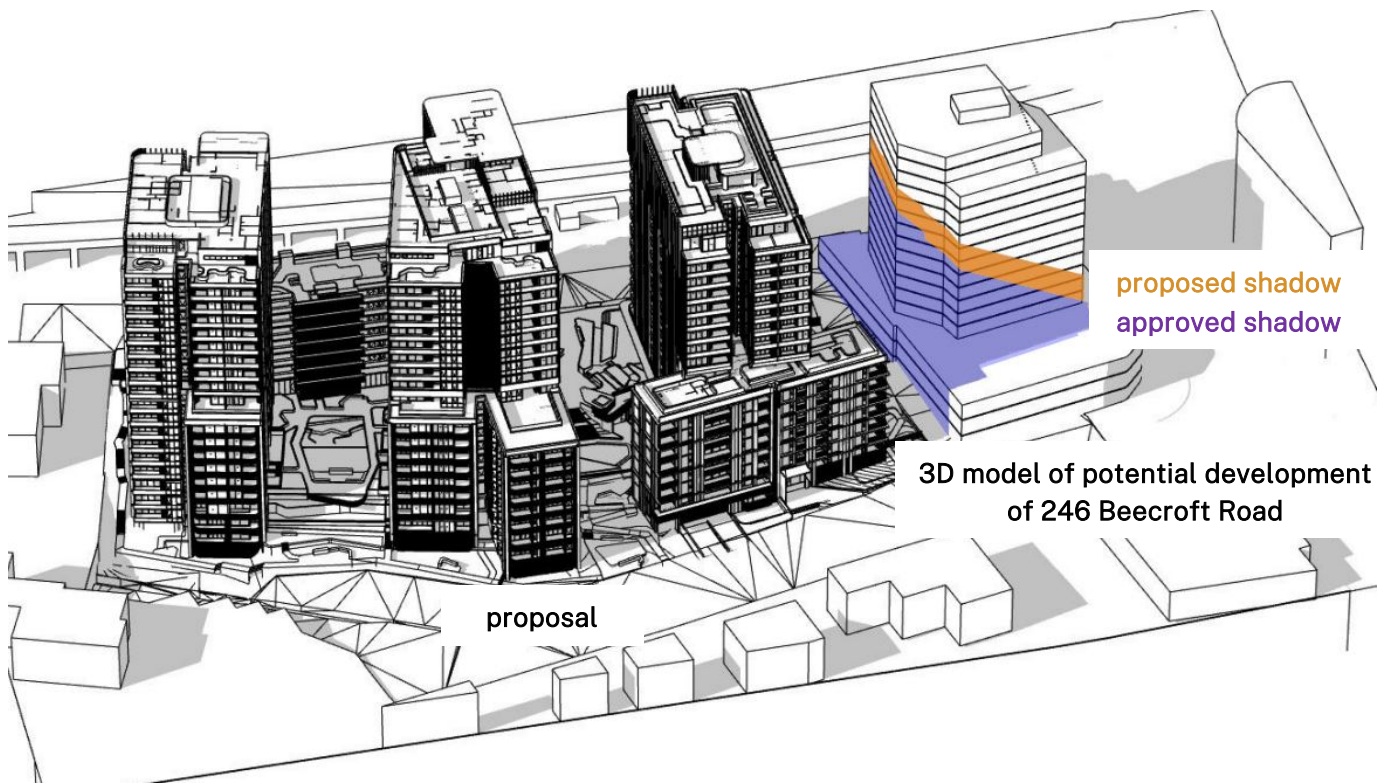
| Overshadowing model, at 1pm in midwinter, of potential development of 246 Beecroft Road, Epping
